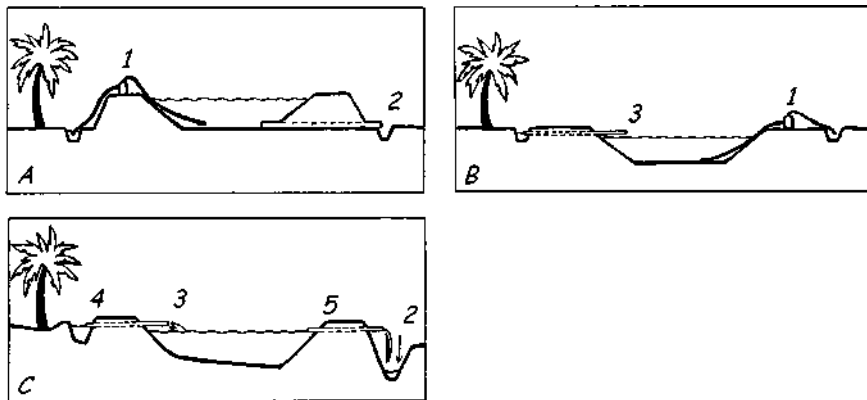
Different types of diversion ponds (Viveen et al., 1985) A: embankment pond B: excavated pond; C: partially excavated pond. See Appendix 1 for an example of how to construct a diversion pond.
